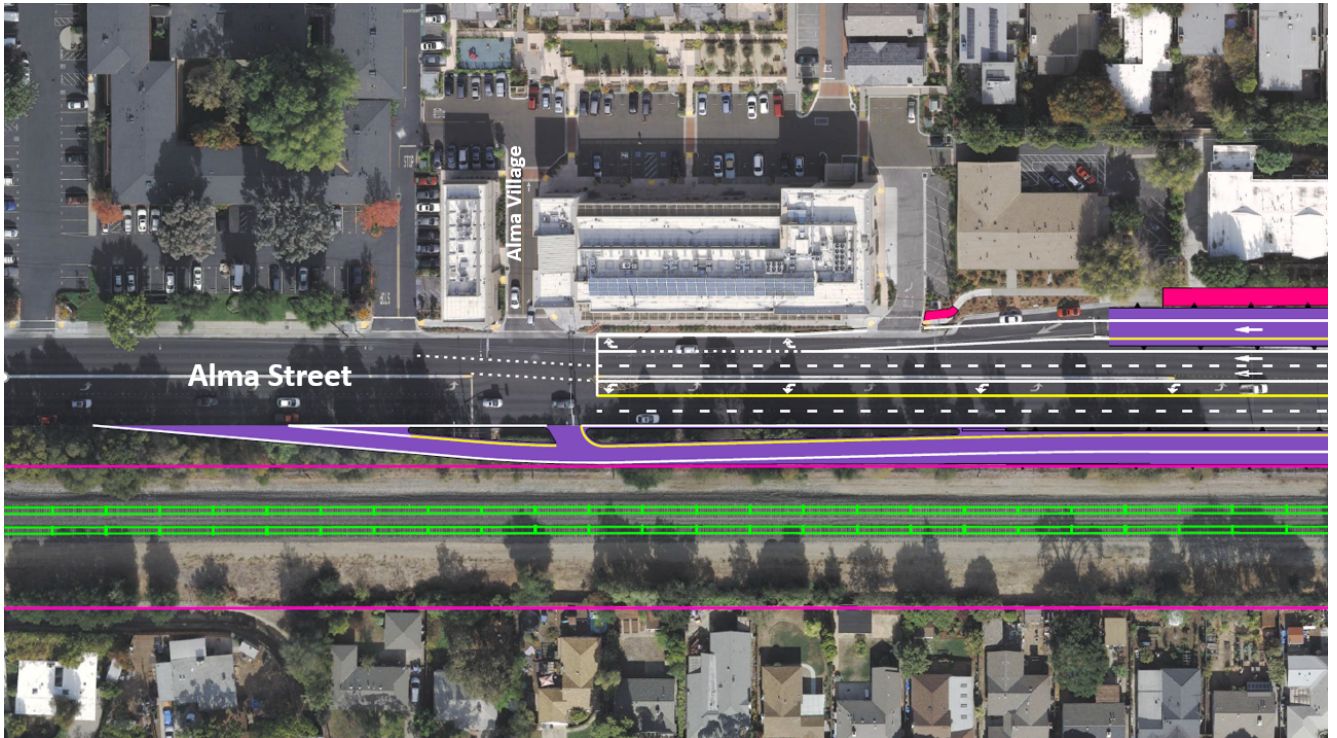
Alma Street at Kellogg Avenue; showing buffer between the sidewalk and travel lane
